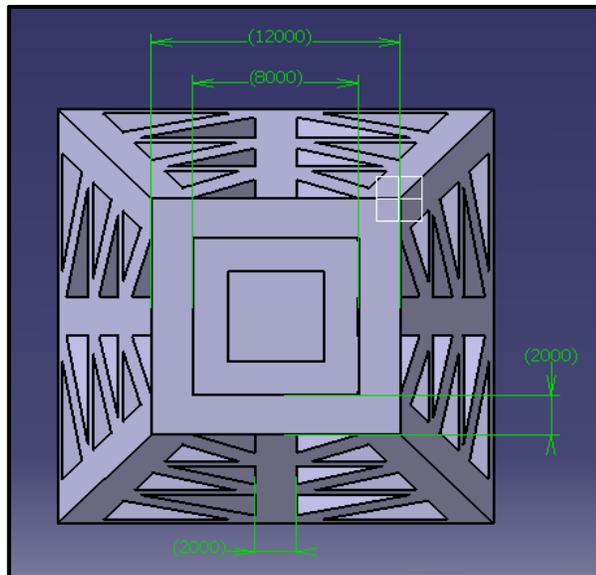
Top view of jacket structure of 2 m x 2 m steel members with dimensions.
